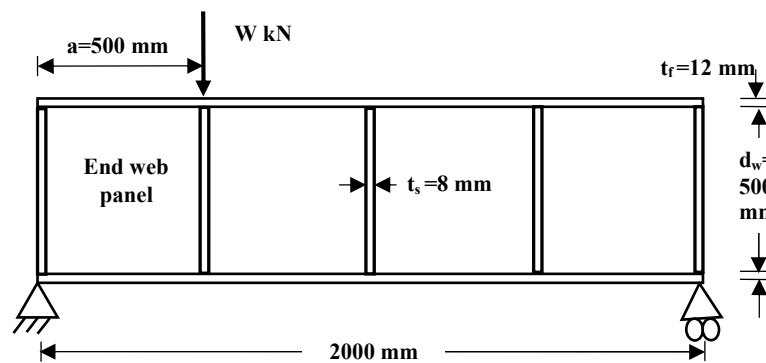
Loading and boundary conditions of steel plate-girder, specimen B1
